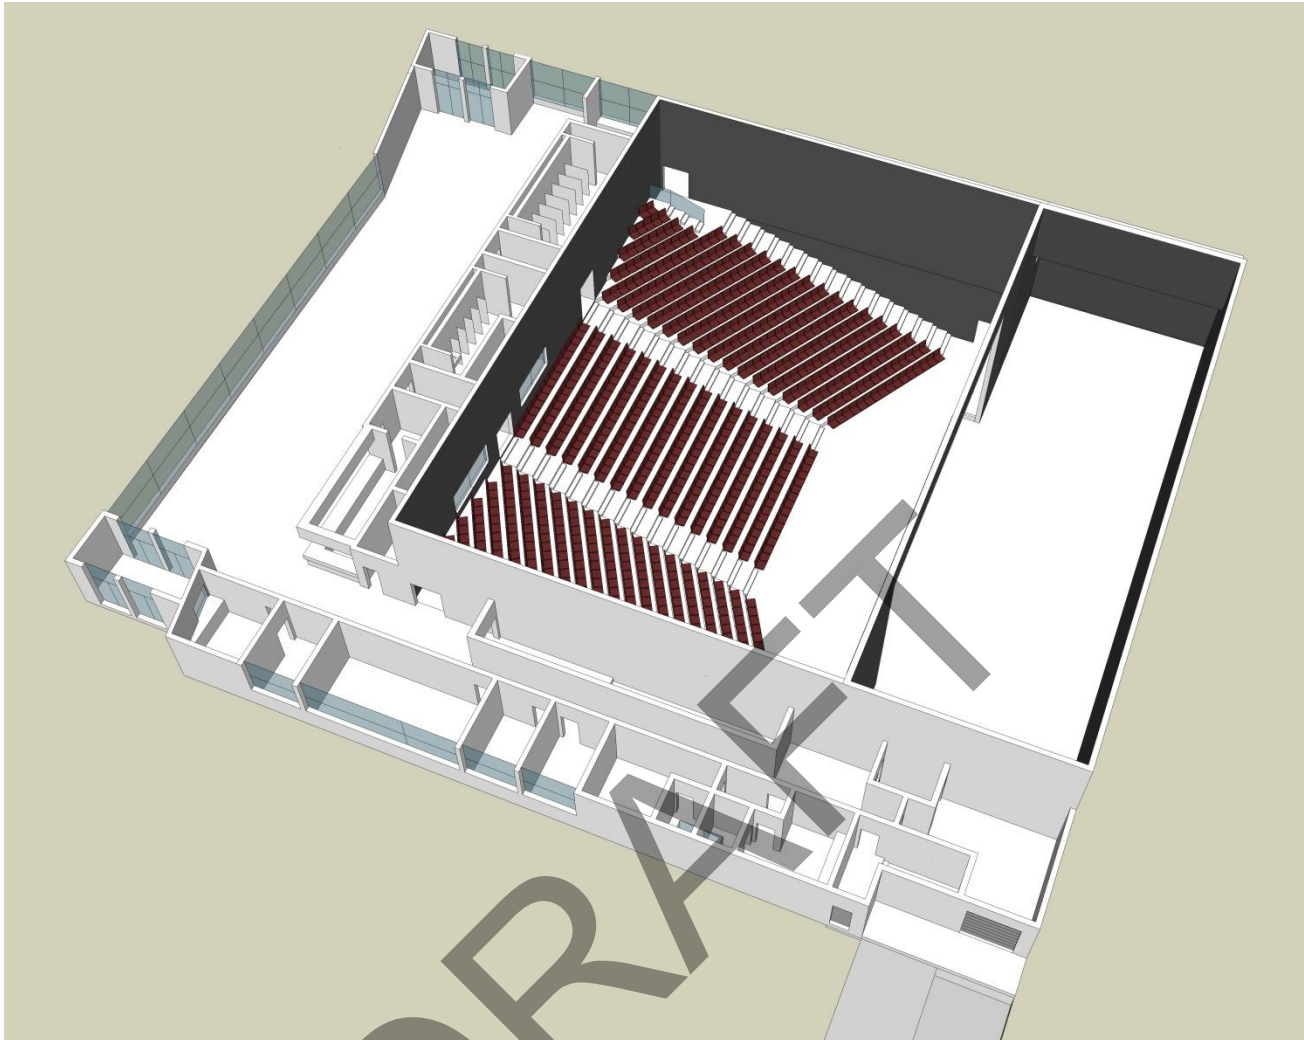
3D View of Conceptual Floor Plan for 800 Seat Concert Hall (D. Hewko 2019)
